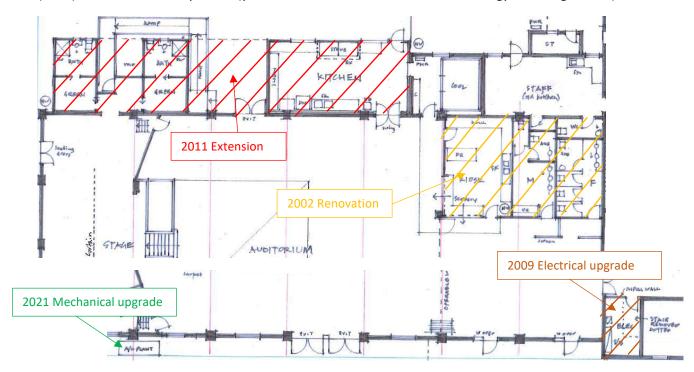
Theatre Royal building - Ground First Floor Plan extract - Noel Thomson Architecture
